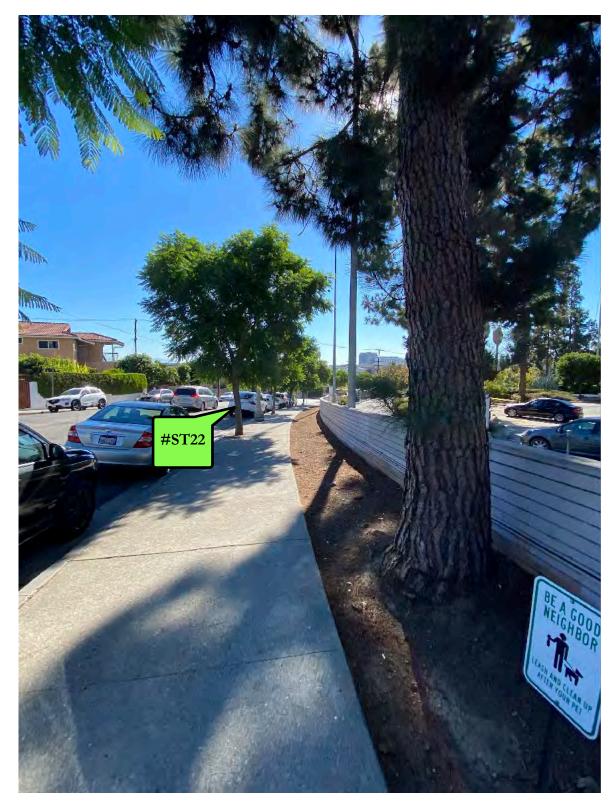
Street Tree #ST22 - to be retained and protected in place.
